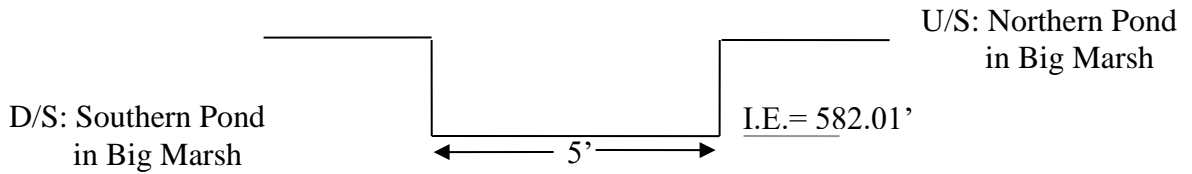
A weir structure connecting the northern and southern ponds in Big Marsh (Structure 5).
